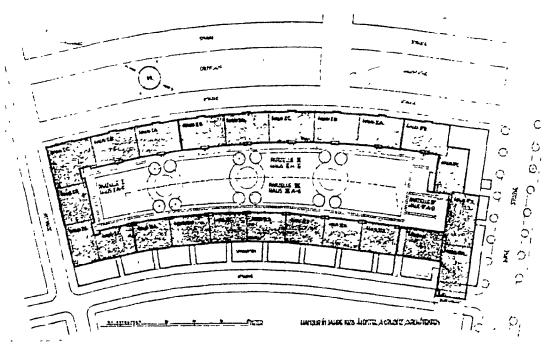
Hamburg-Jarrestadt. Plan of a slightly curved perimeter building block. (Adler, 1931)
